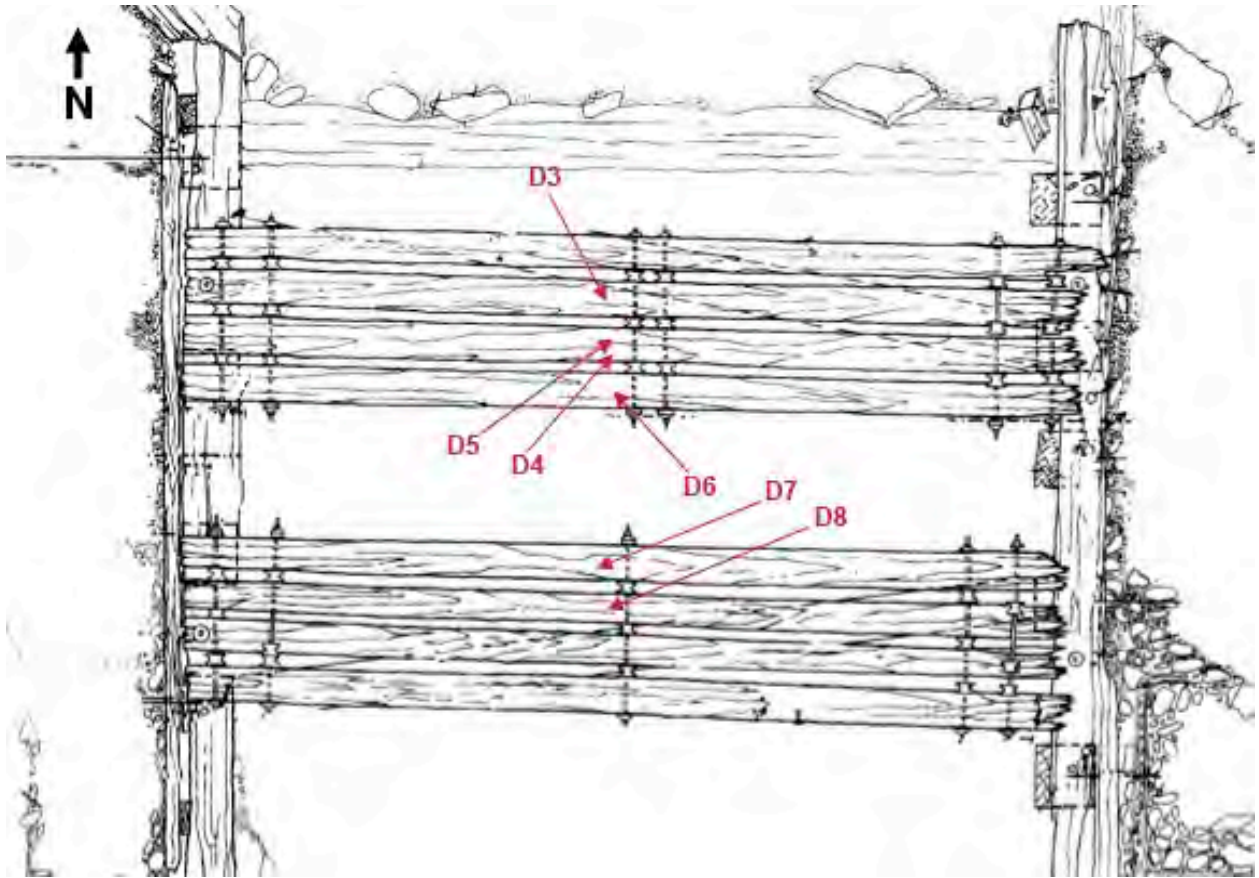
Trestle #1 Plan (deck removed) with resistance drilling locations (red).
